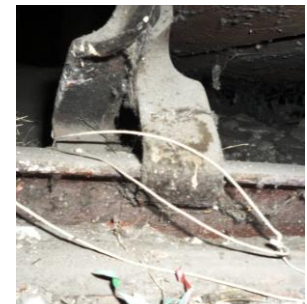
Connection between timber truss and I beam through strips wrapped around the flange, with no bolting.
